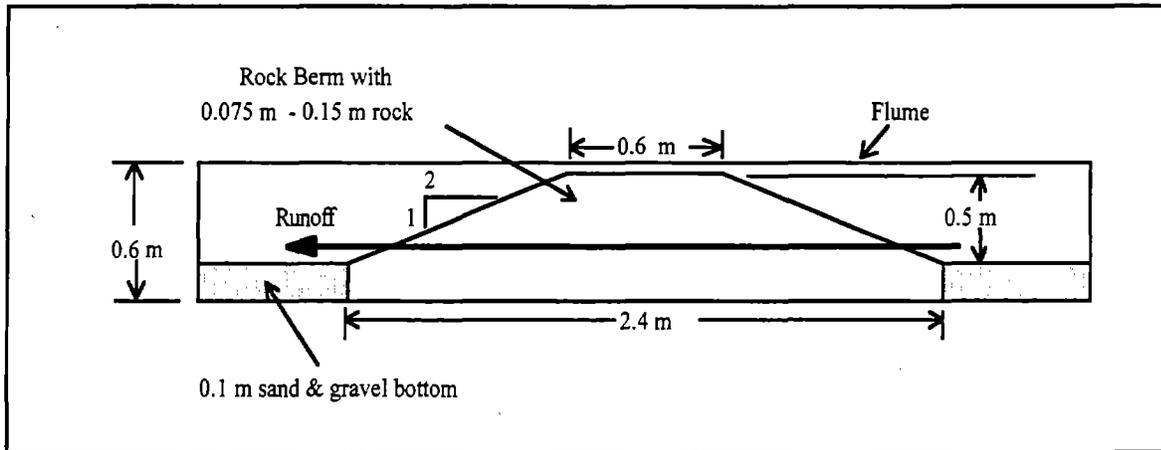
Section of Flume and Rock Berm Cross-Section
